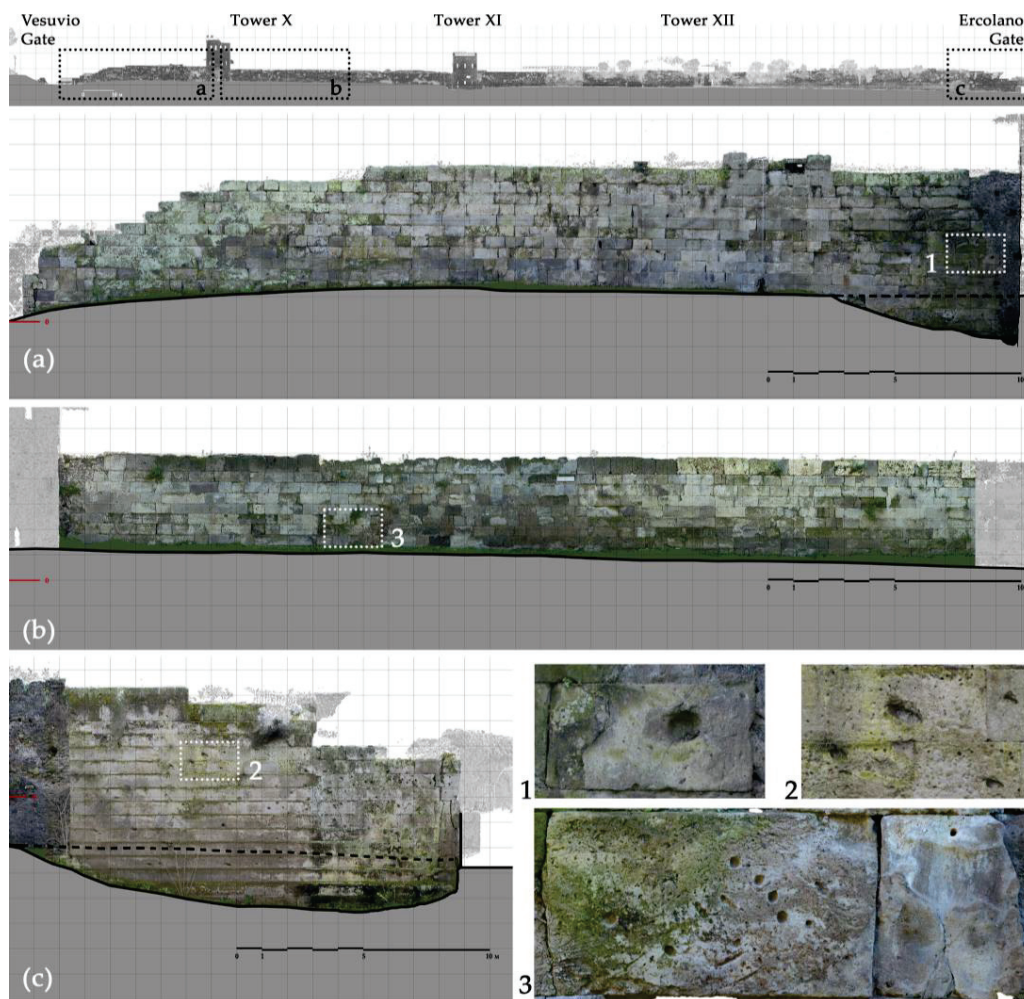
Orthophotos of the north wall, corresponding enlargements of wall sections (a–c), and examples of ballistic impact marks (1–3). Highlighted areas: (a) segment between Vesuvio Gate and Tower X, (b) wall section west of Tower X, and (c) wall section east of Ercolano Gate—representing the zones most affected by ballistic impacts: (1) stone balls, (2) lead sling bullets, and (3) metal darts.
